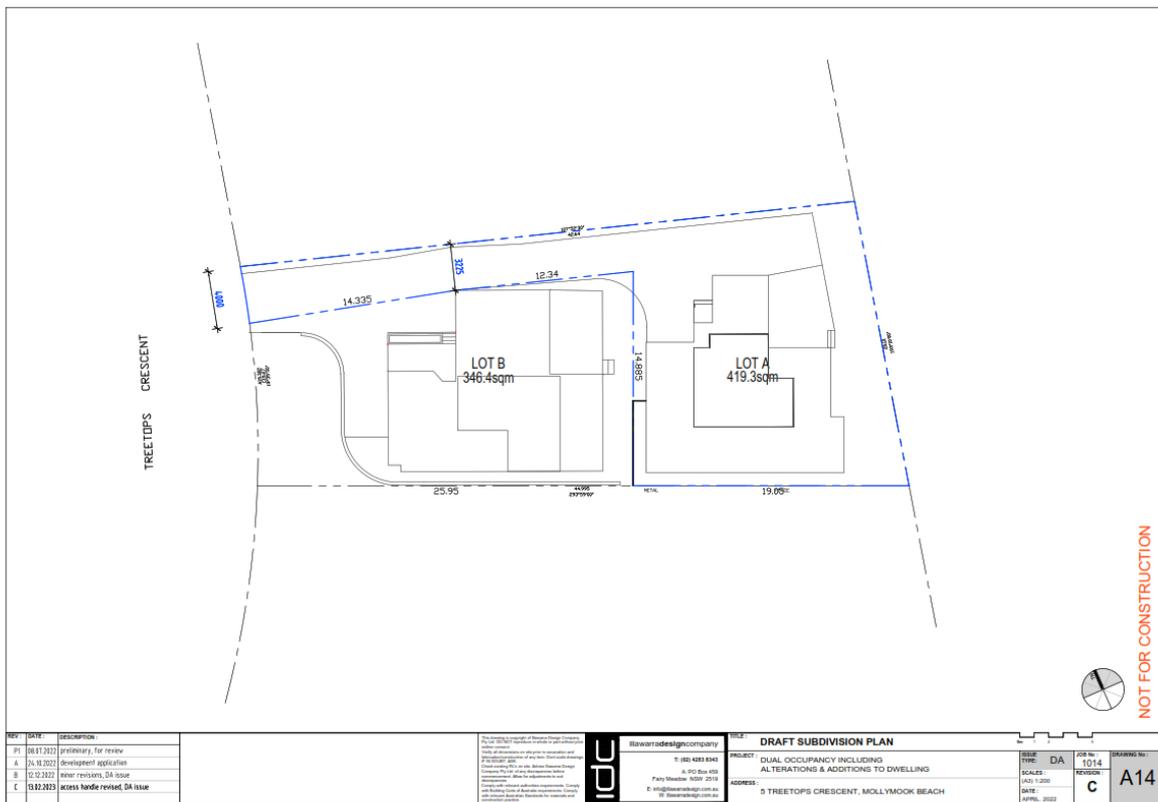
Proposed Subdivision Plan – 5 Treetops Crescent Mollymook Beach
